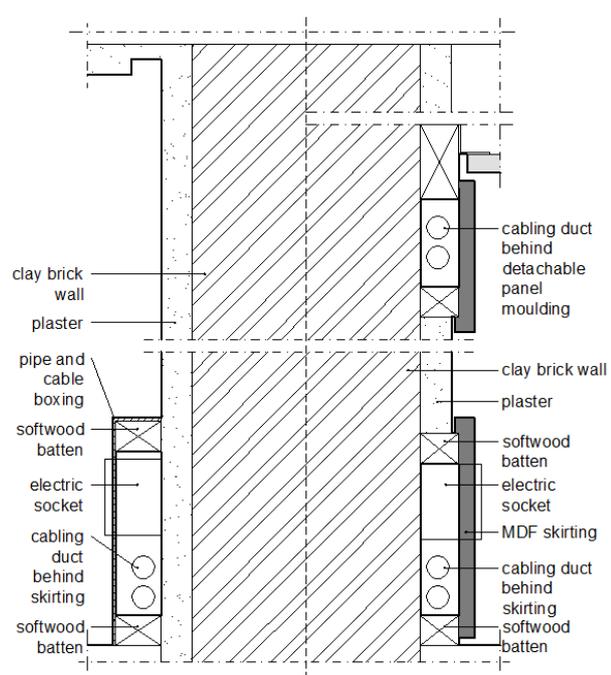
Hypothesis for laying cables in an existing clay brick wall to ensure easy maintenance and upgrading
